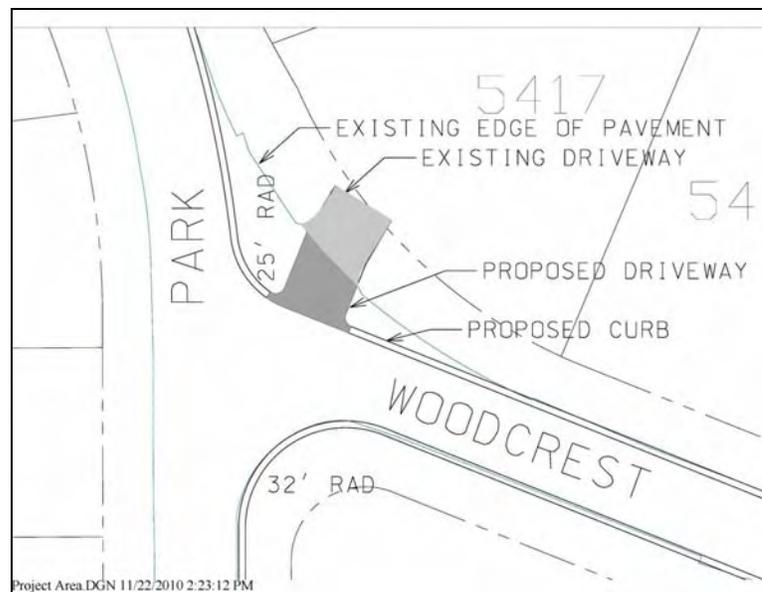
Proposed Geometric Configuration at Park Place/Woodcrest Intersection
